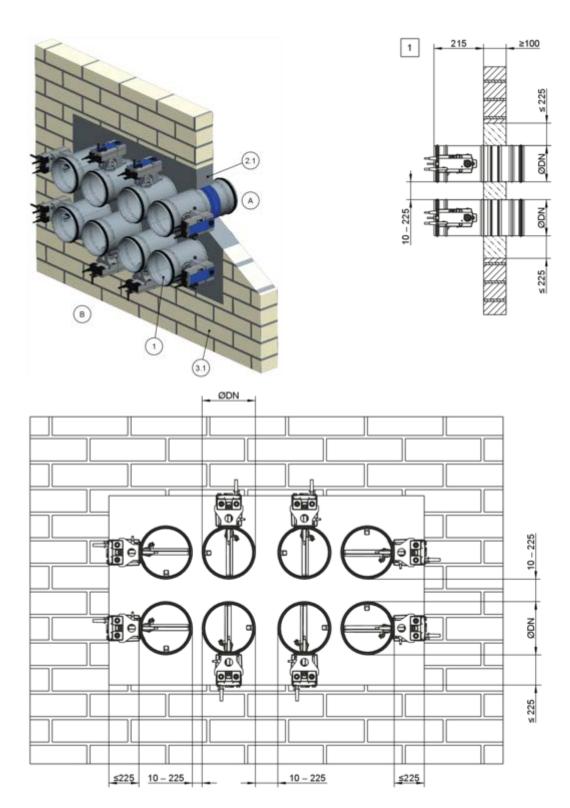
Mortar-based installation – multiple occupancy of one installation opening
